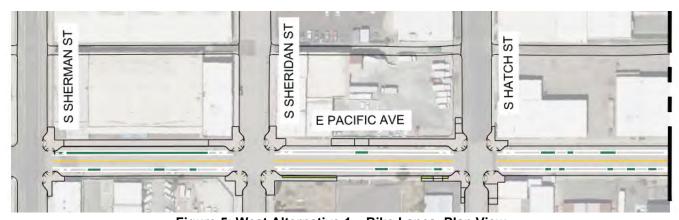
West Alternative 1 - Bike Lanes, Plan View
